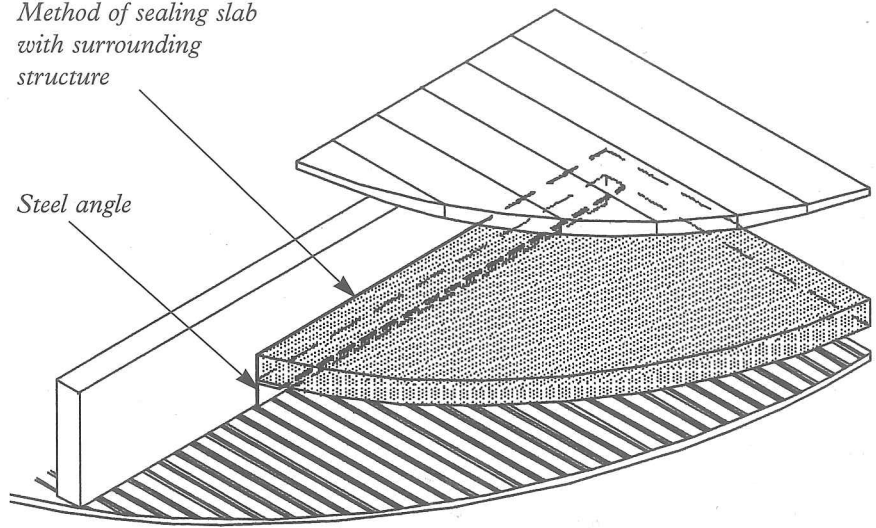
Intumescent coated mineral wool slabs used to upgrade a floor/ceiling
